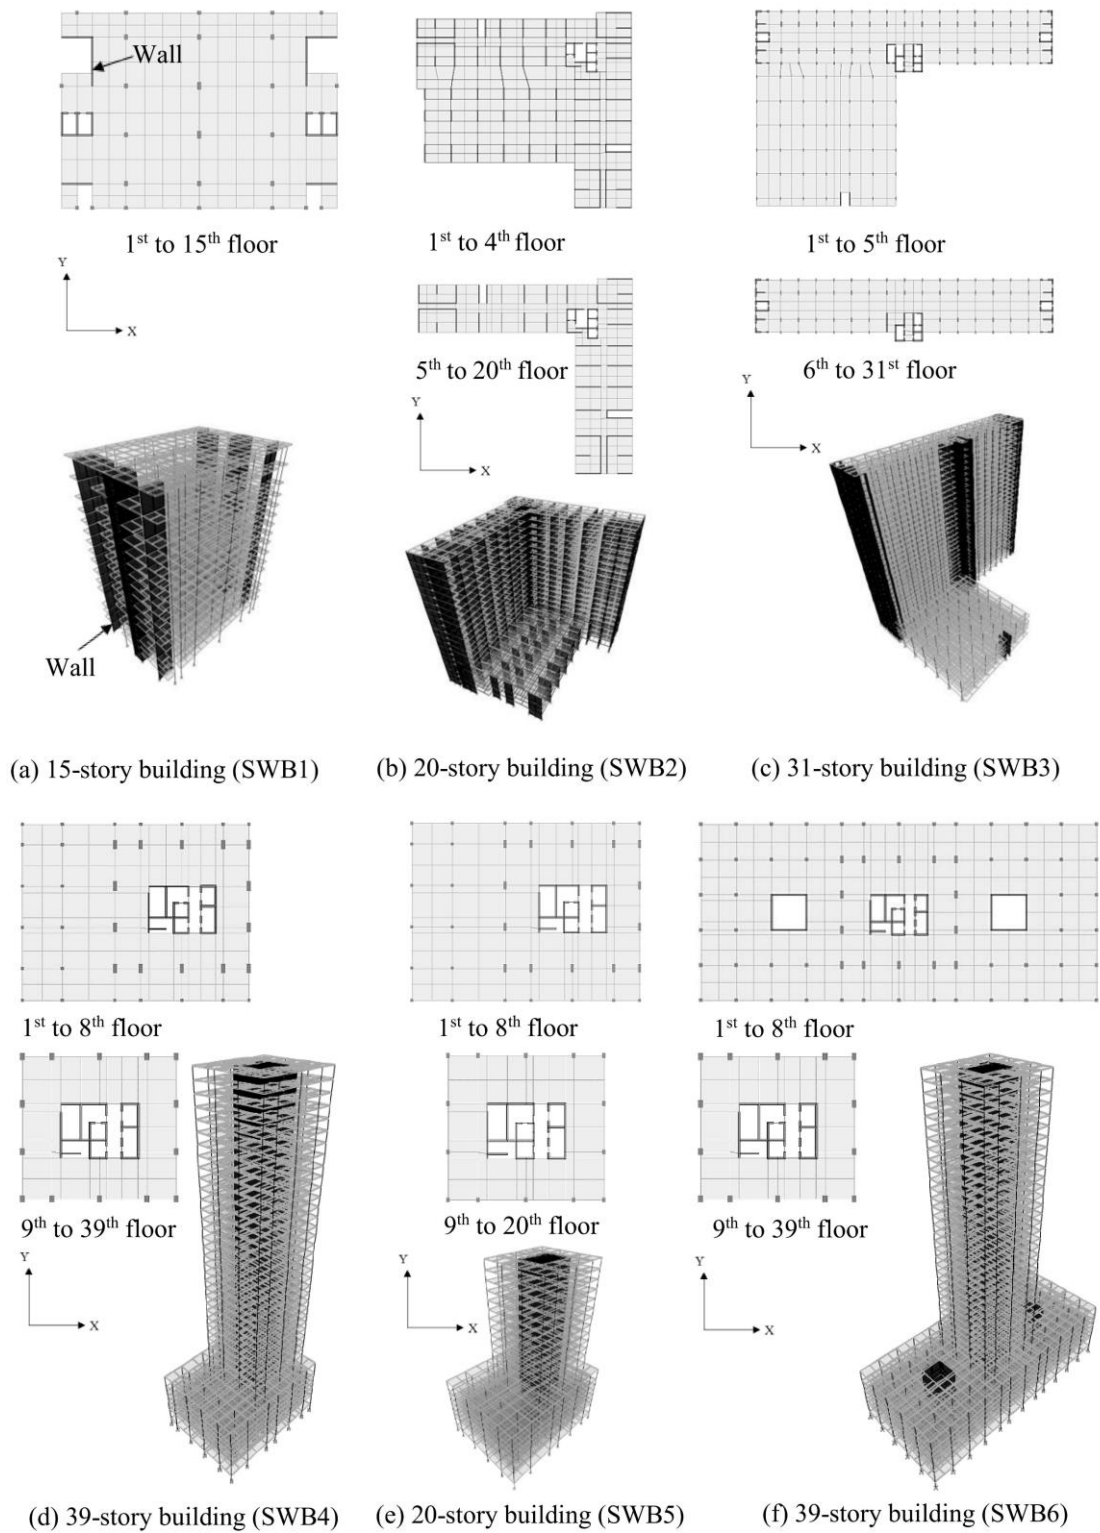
Floor plans and three-dimensional models of tall RC shear-wall buildings.
